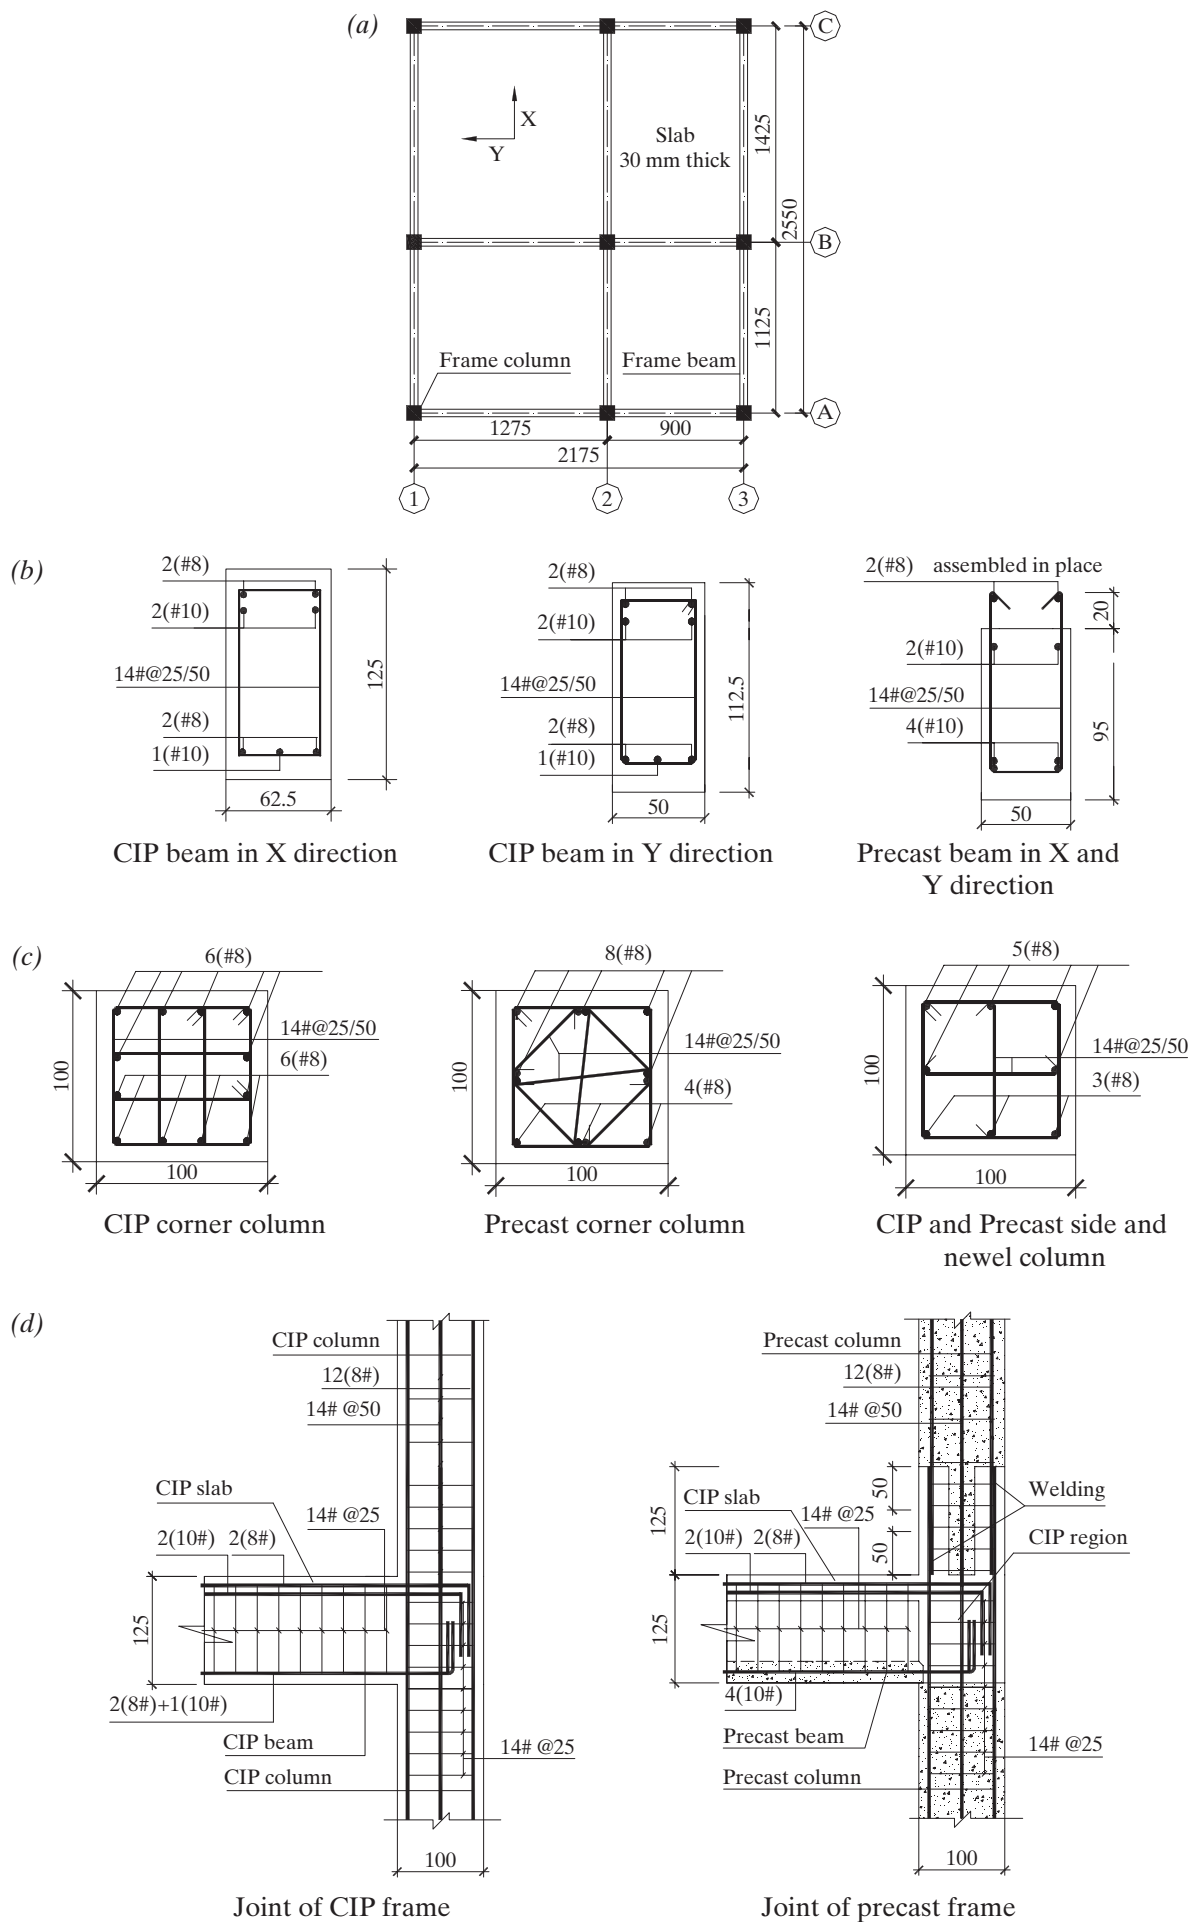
Configuration and reinforcements for two RAC frame models. (a) Plan layout; (b) reinforcements for the frame beams; (c) reinforcements for the frame columns; (d) reinforcements for the frame joints (Unit: mm)
